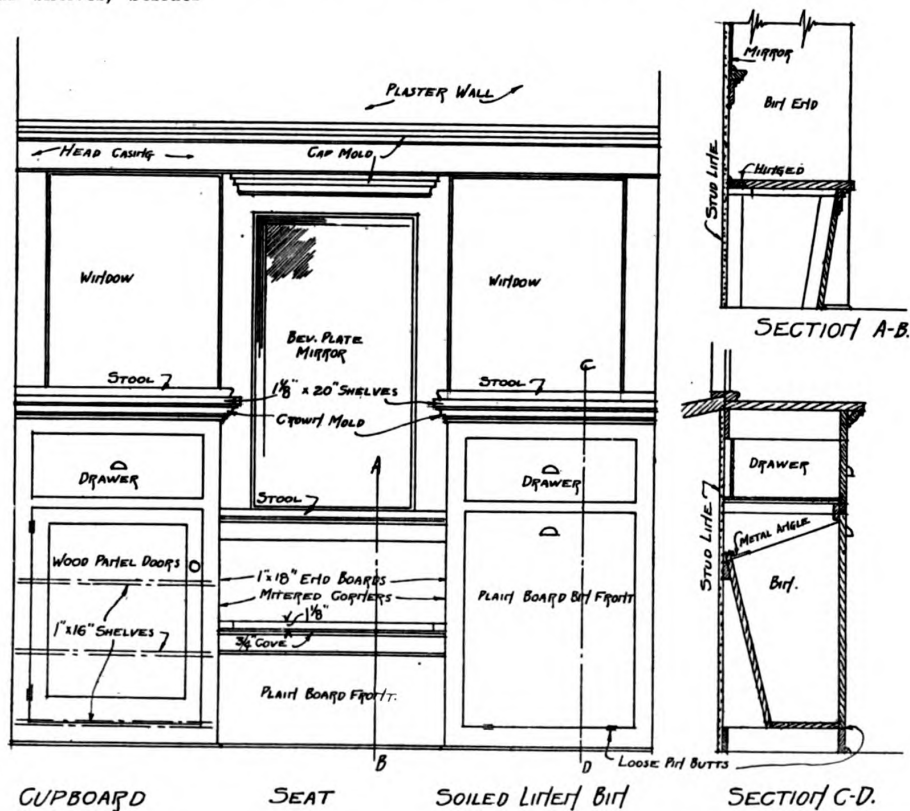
Front Elevations of Bathroom Cupboard and Soiled Linen Bin with Vertical Sections—Scale $\frac{1}{2}$ In. to the Foot
